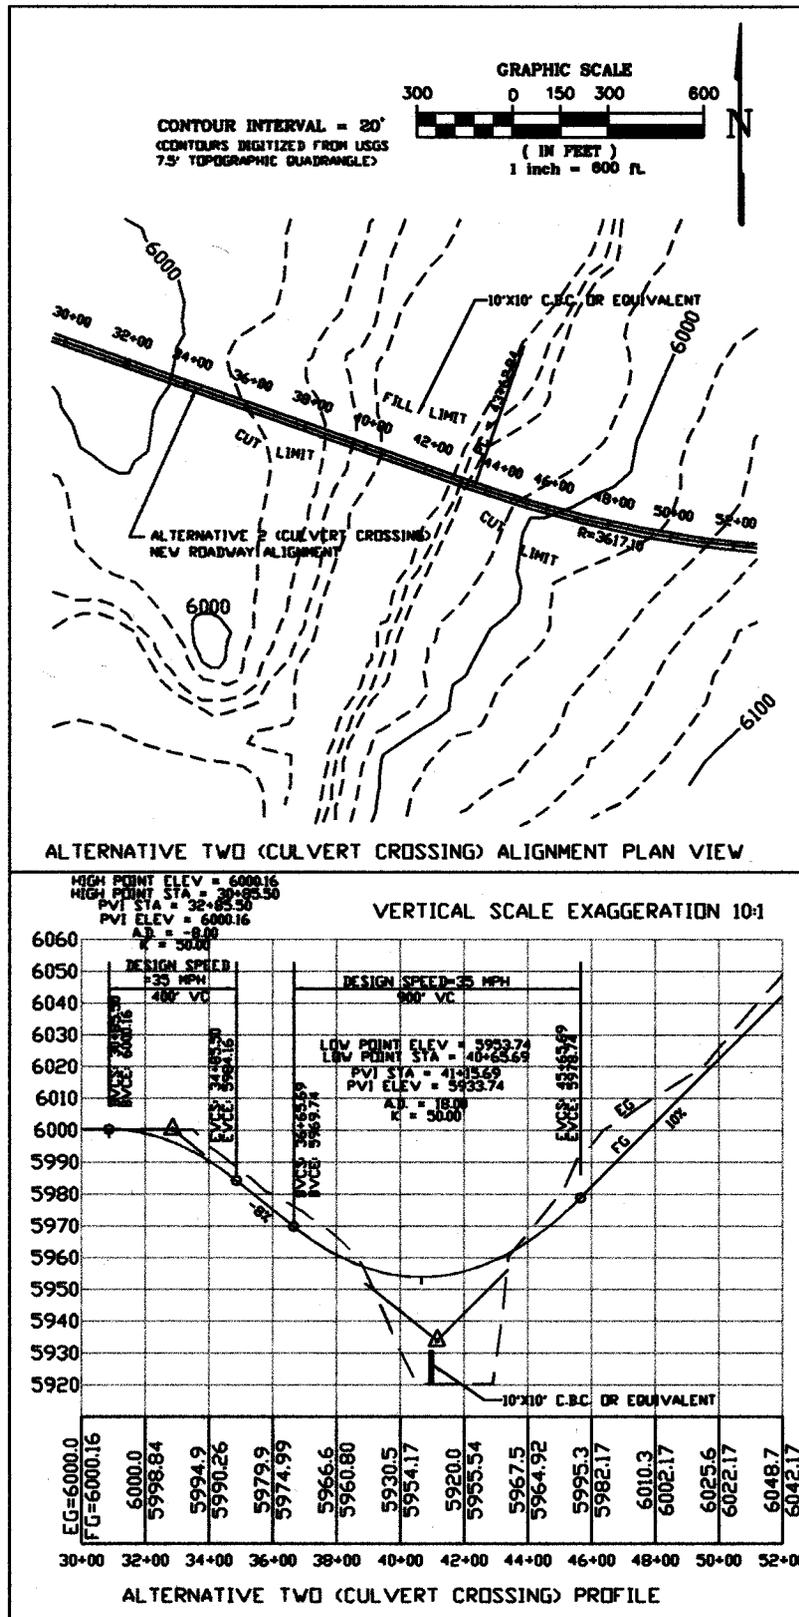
ALTERNATIVE 2 (CULVERT CROSSING) PLAN AND PROFILE
